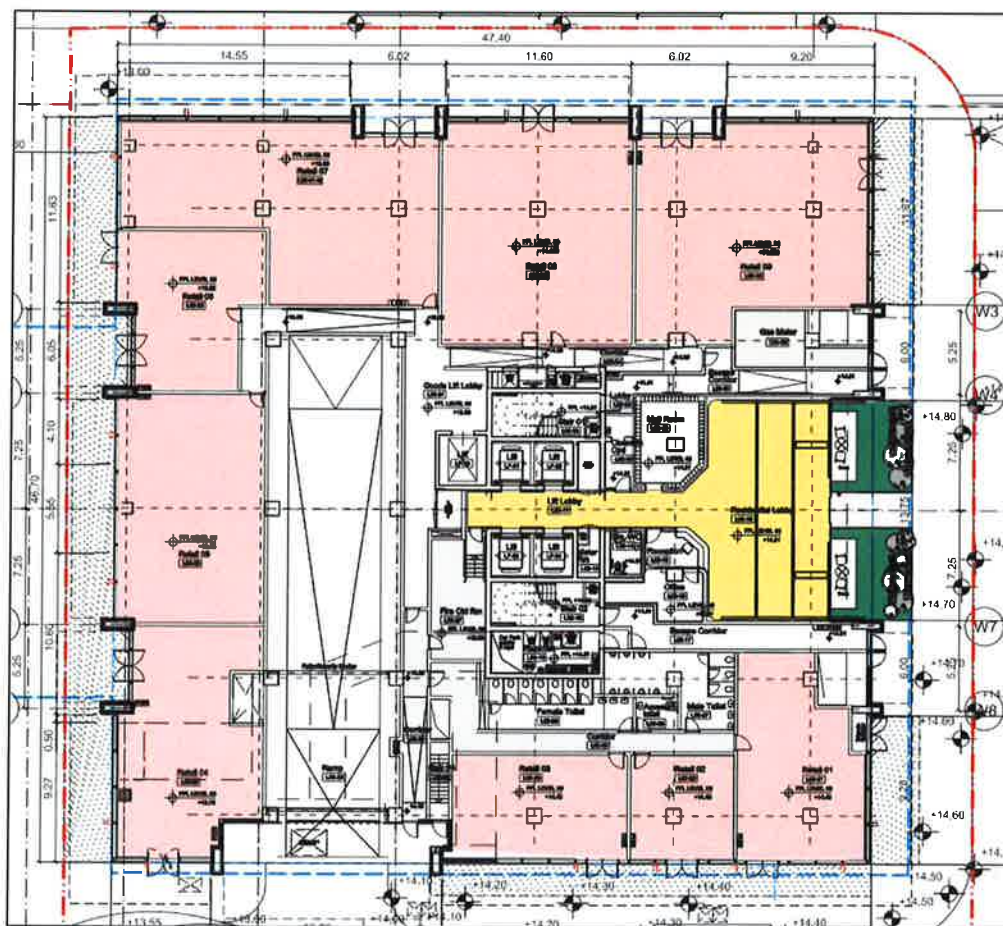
Proposed layout of Ground floor (Source: Modification Application)
